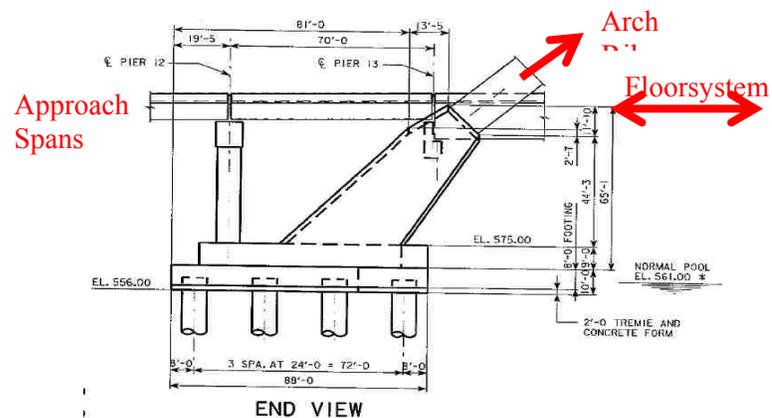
True Arch Foundation - I-74 over the Mississippi River - Preliminary
